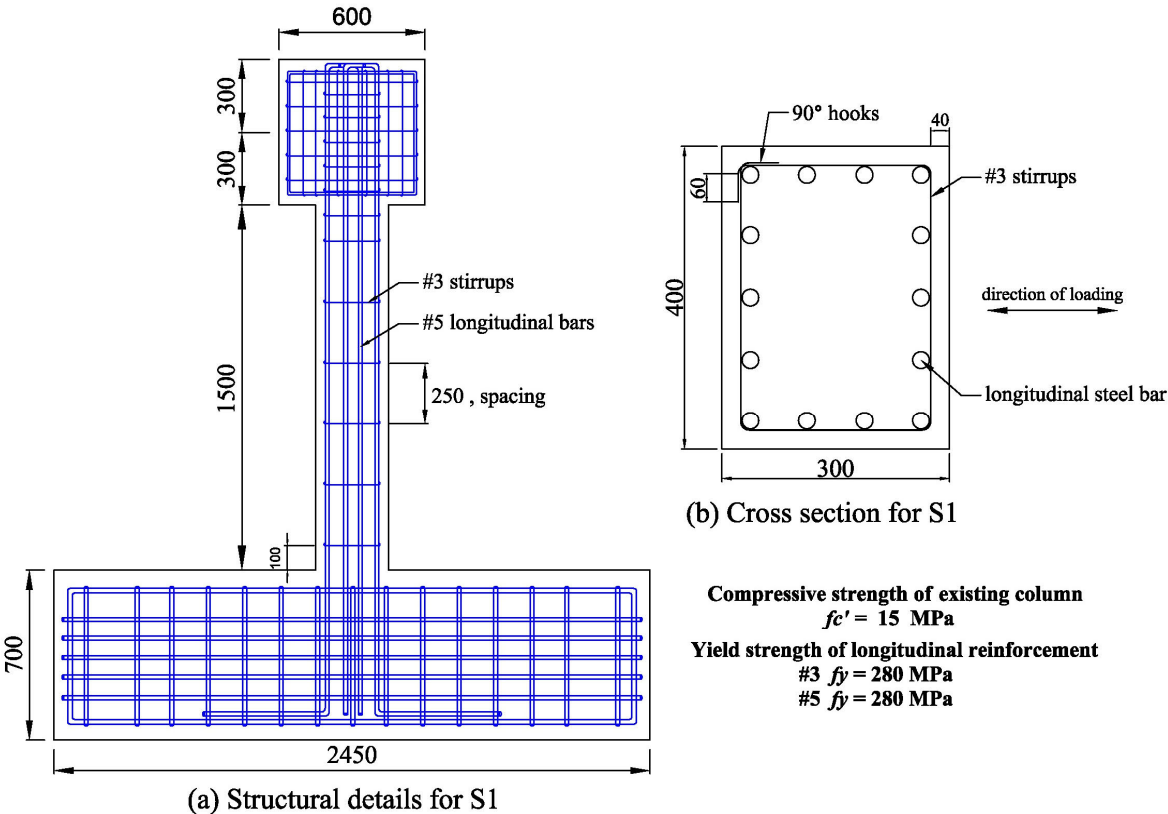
The specimen configuration and details of the substandard column (unit: mm)
